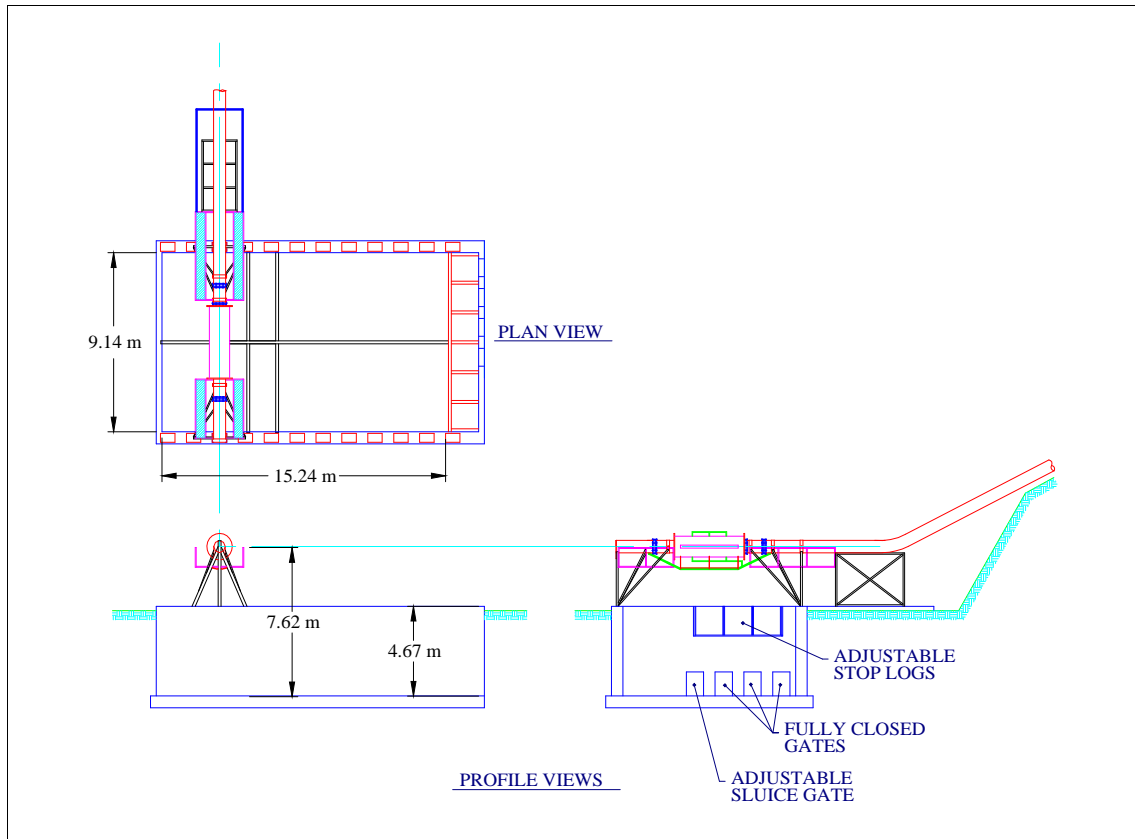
Dam Foundation Erosion Facility -- plan, side elevation and front elevation.
